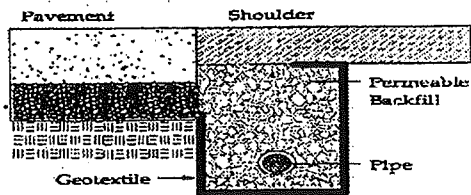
Geotextile wrapped edgedrain, post-pave installation (FHWA 1990).
